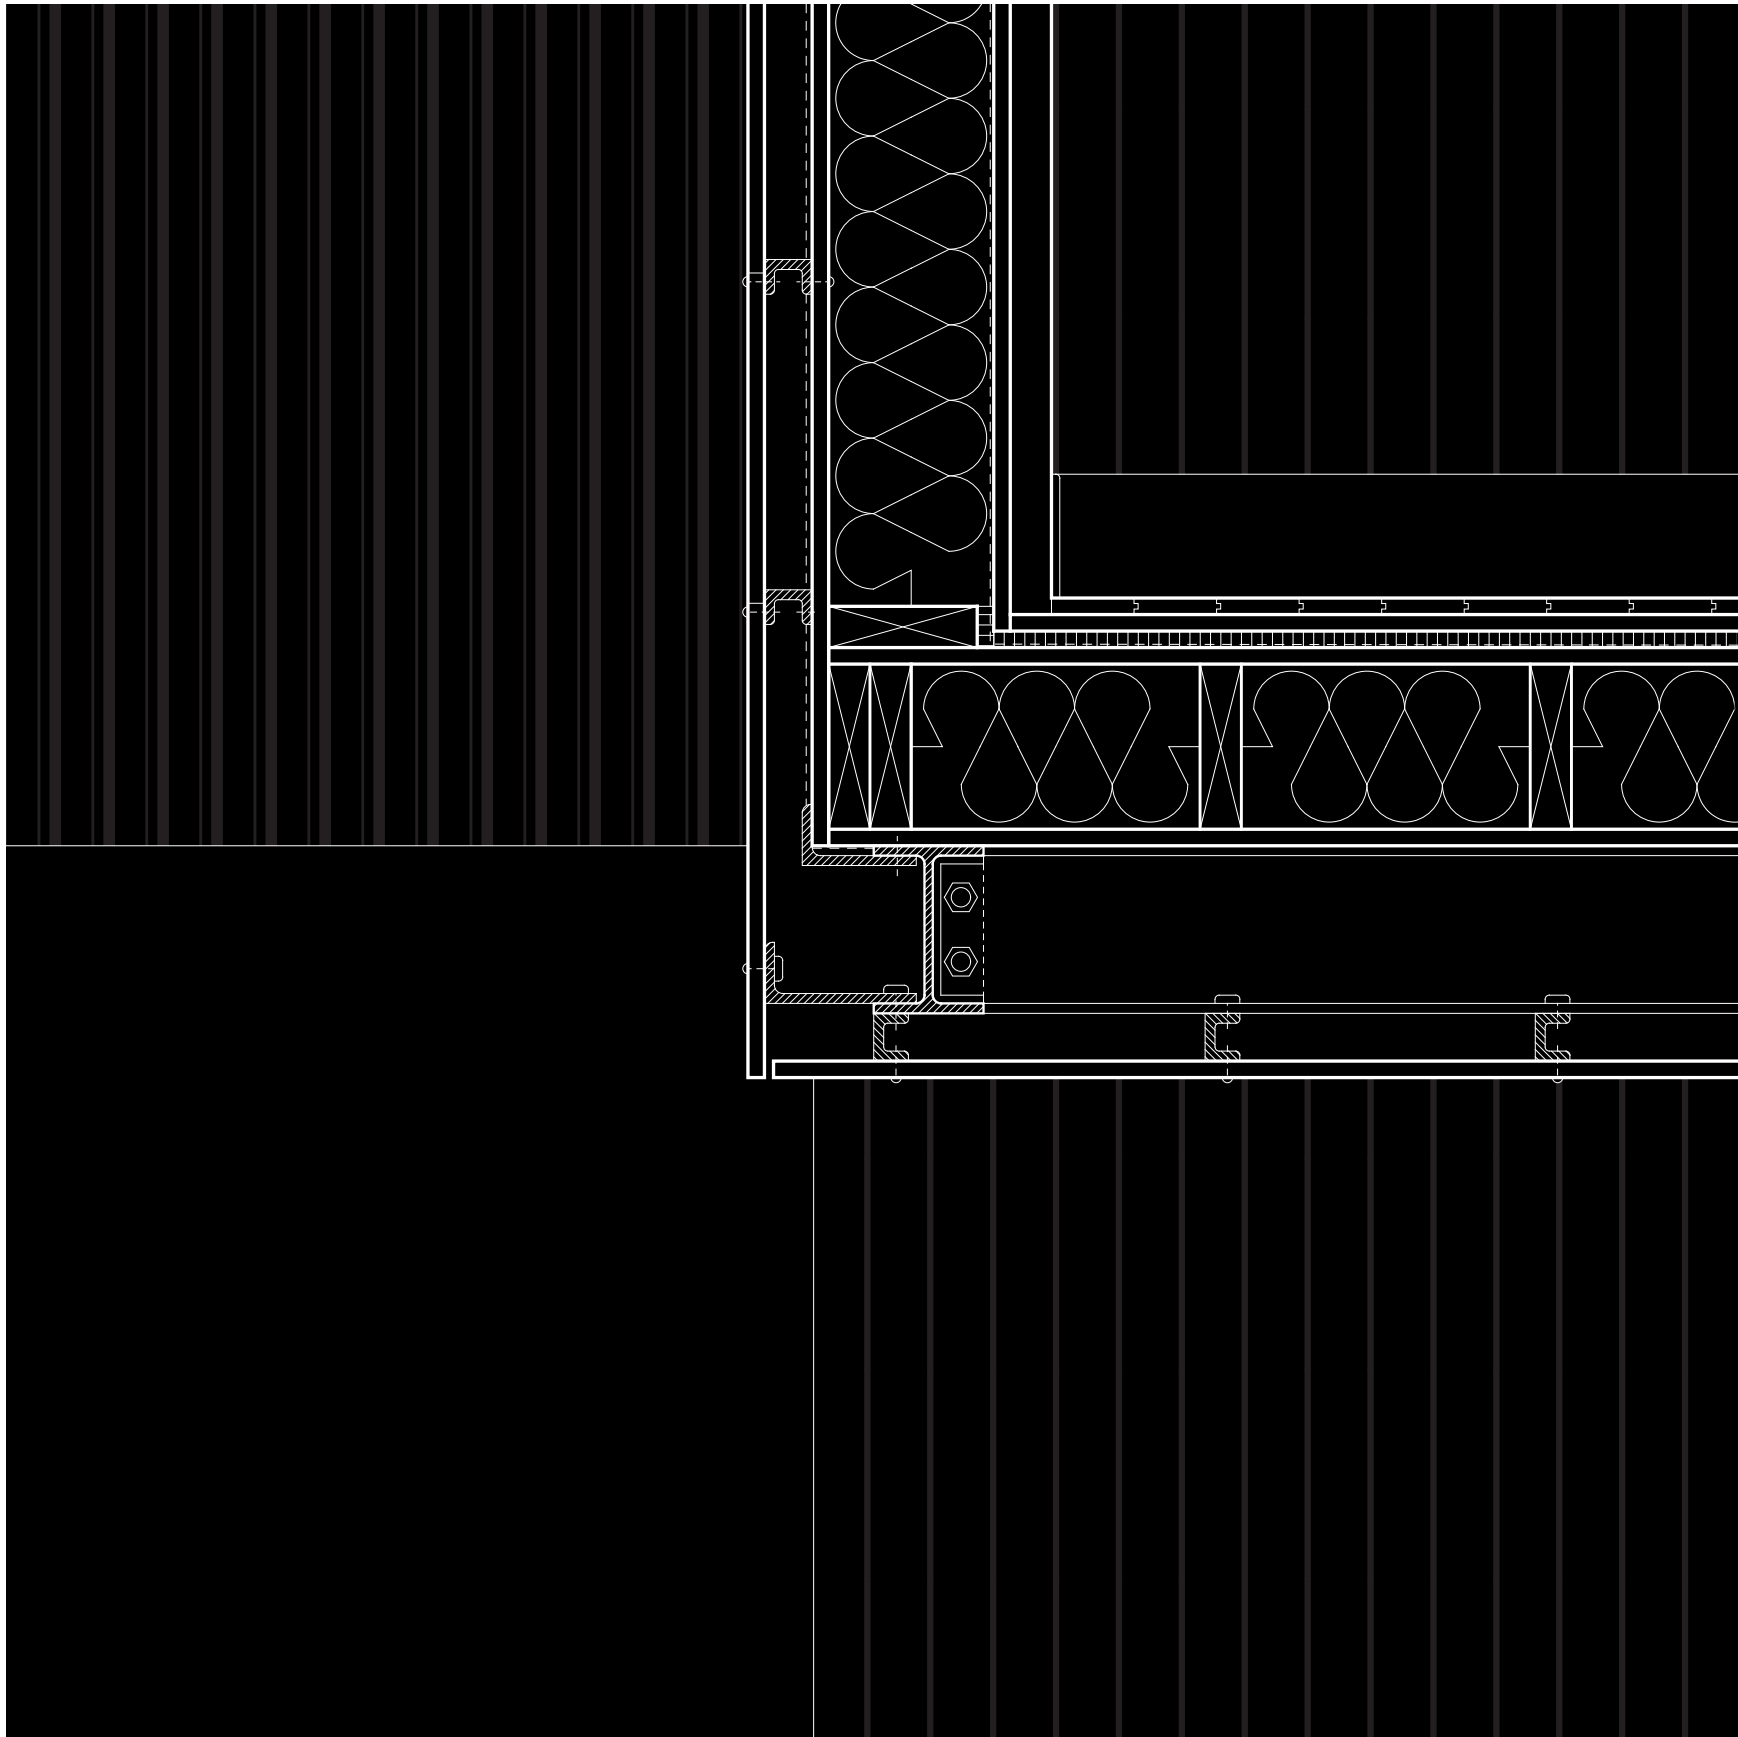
Detail Drawing Highlighting The Wall & Floor Construction of the Warehouse and the Maintainable Facade.
